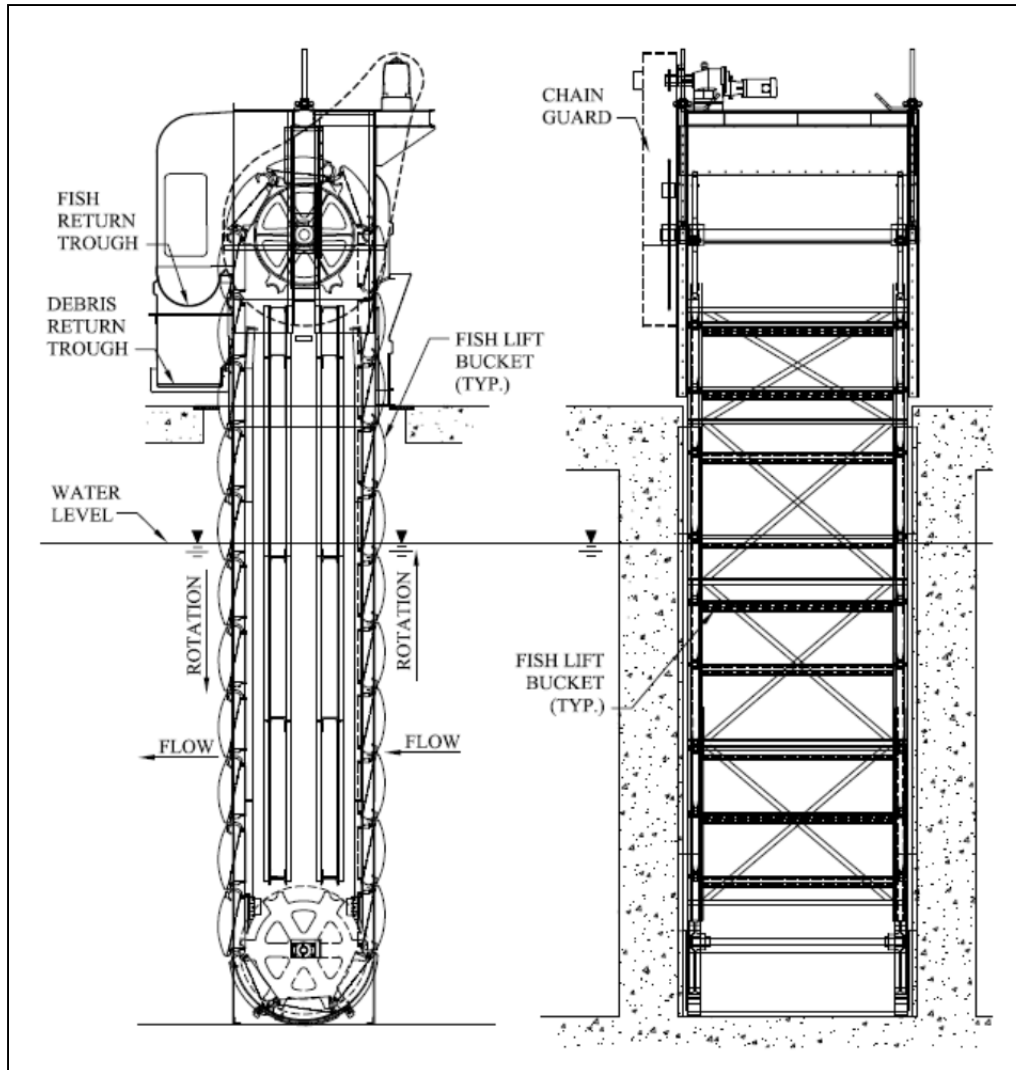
Section and elevation views of a typical through-flow modified TWS.
